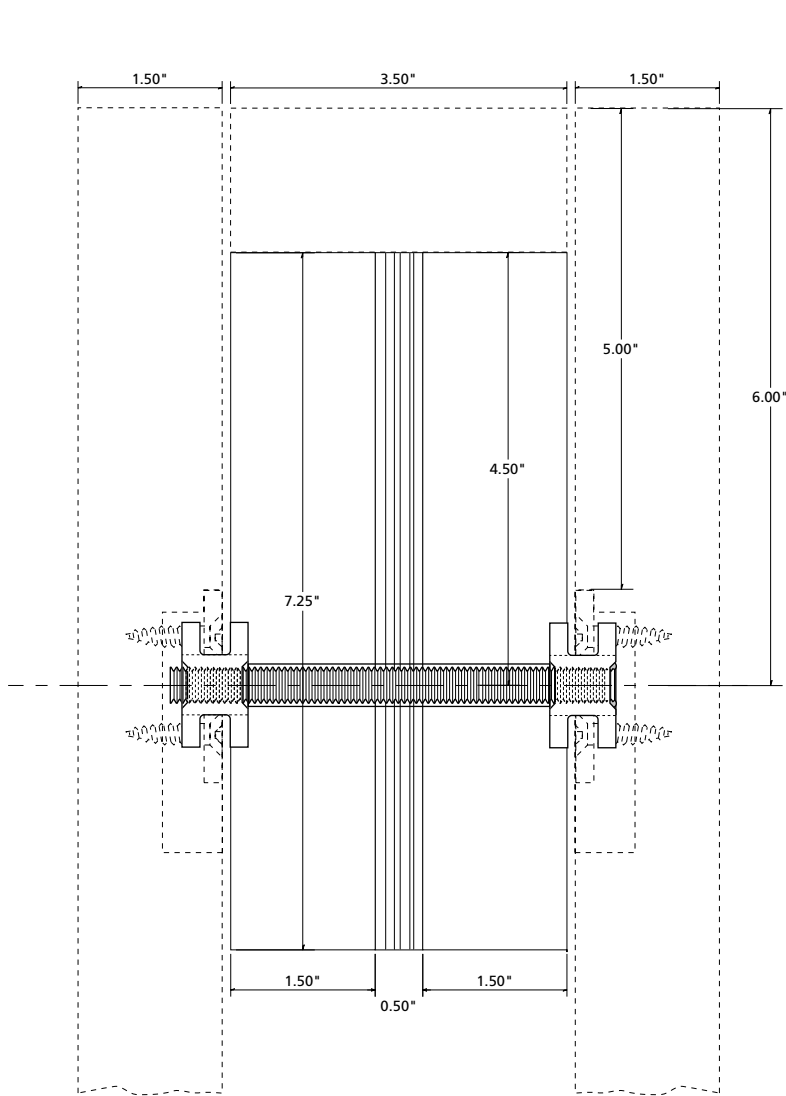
DETAIL E UPPER WOOD RAIL ASSEMBLY FRONT ELEVATION
